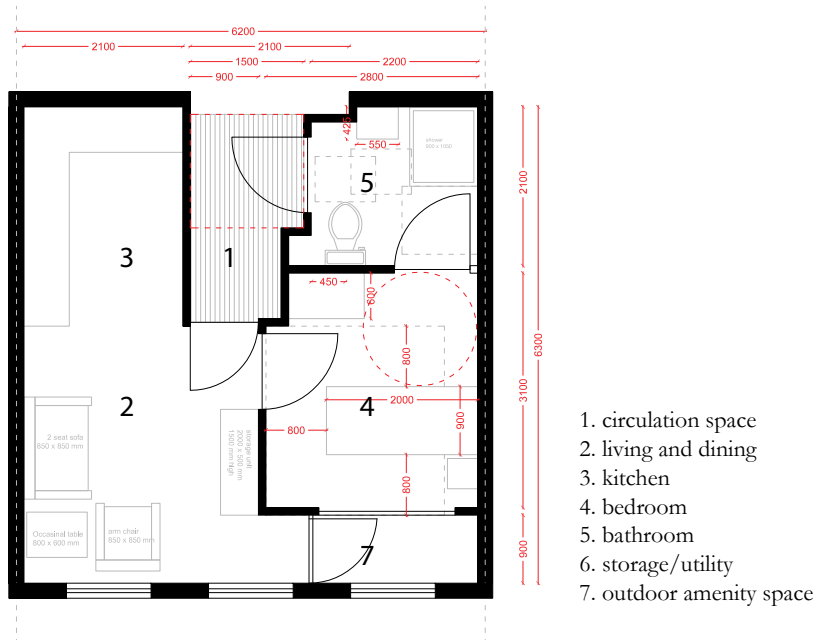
Transformation of the 2b3p-flat floor plan (scale 1:100)
